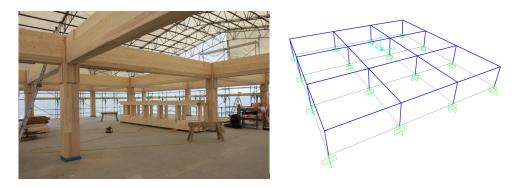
3D Frame a) Construction Site b) Model in SAP2000
